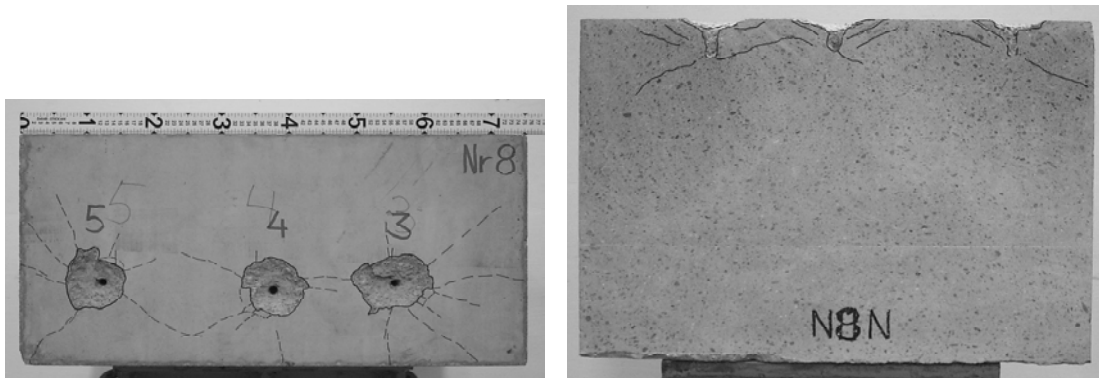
Left: Top view of concrete block No. 8 after being shot with single fragments. Right: Macro-crack pattern in the cross section of concrete block No. 8 (after cutting into halves).
